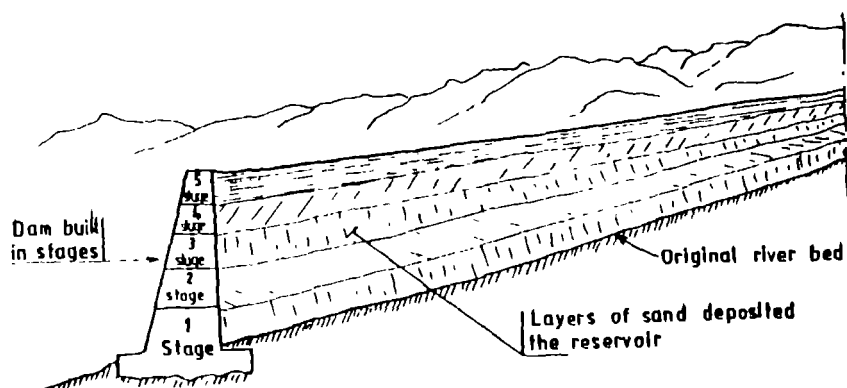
Construction of sand-storage dam in stages. (Burger and Beaumont 1970).
